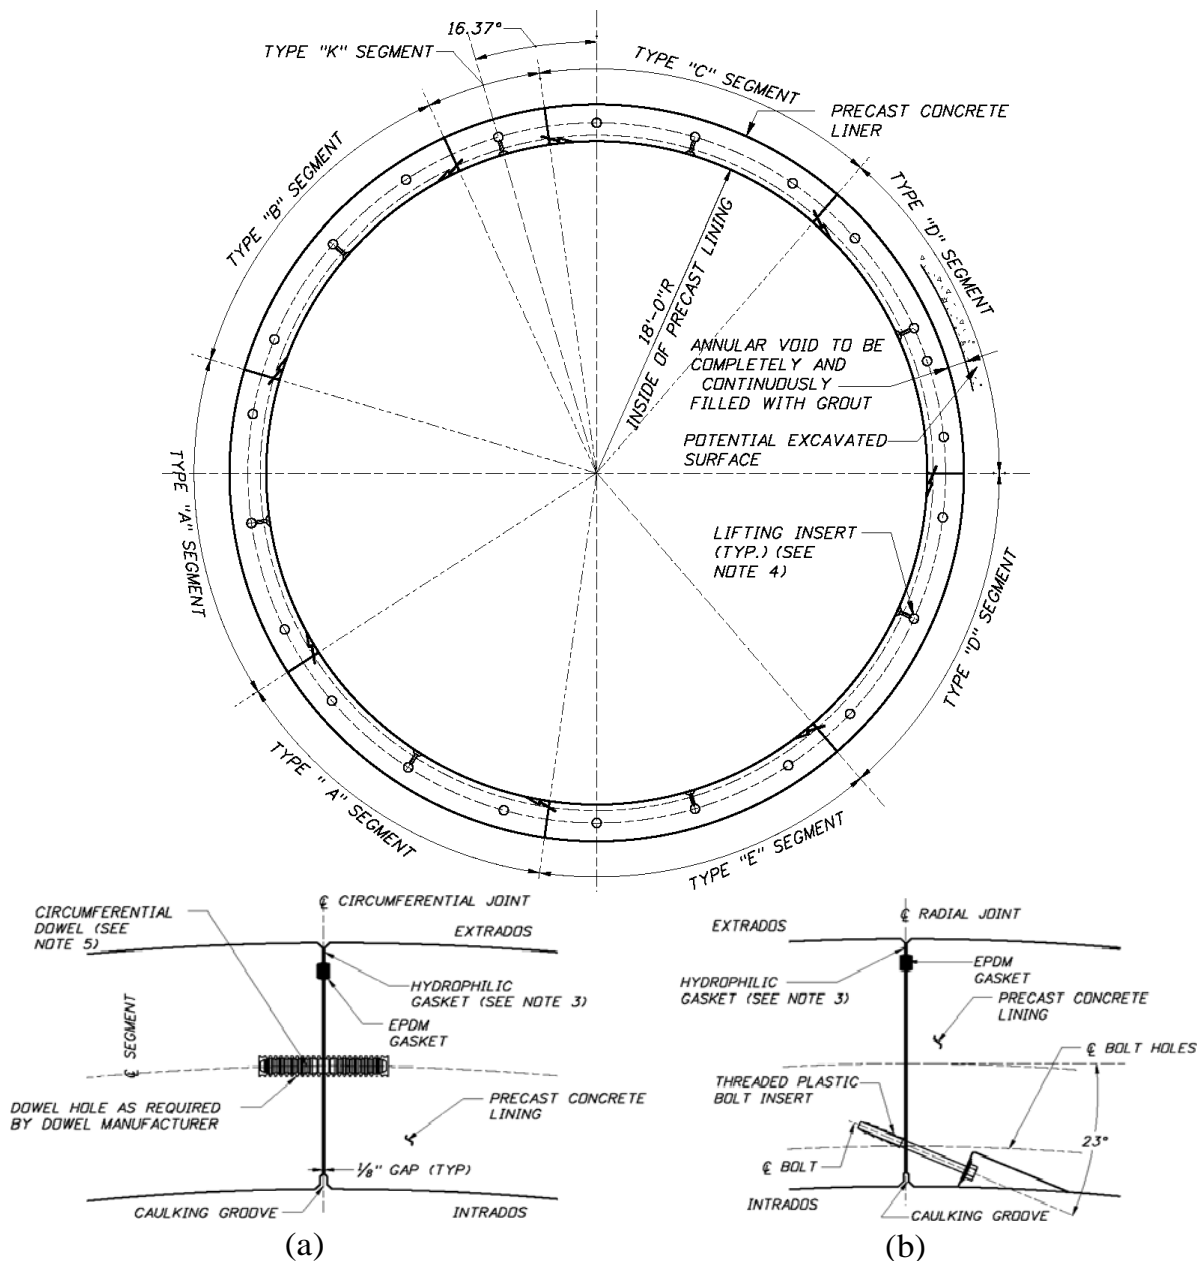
A Typical Seven Segment and a Key Segment Precast Segment Lining: (a) Circumferential Dowel; (b) Radial Bolt
